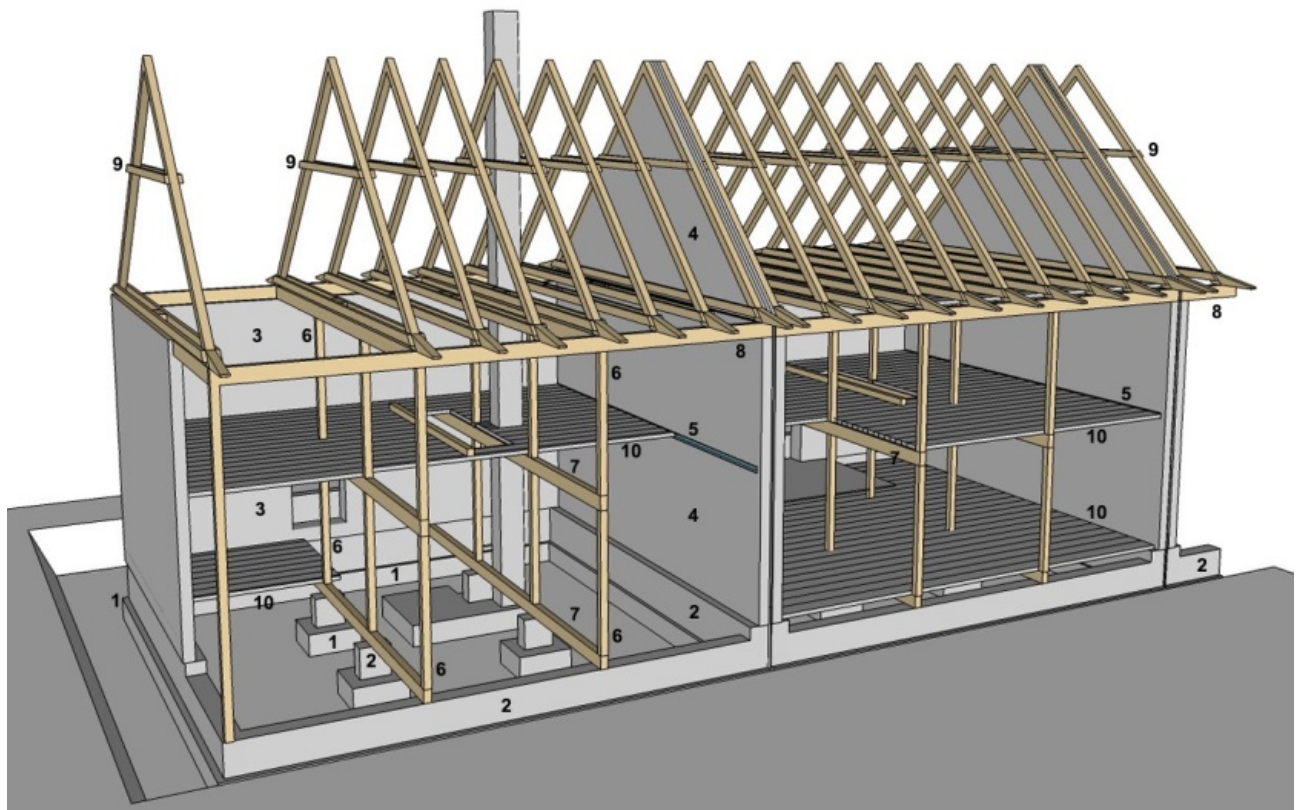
1 foundation 2 concrete bricks 3 thermal brick 38 cm 4 acoustic brick 2x18 cm with insulation in between 5 u-steel profile with fish plates for slab 6 glulam posts 12/12 7 glulam beams 12/24 8 glulam beam 12/24 9 rafter frames 10/18 + 2 x boards 5/12 10 thin slab of massive wooden boards d= 6,5 cm, double-tongued and grooved, not polished
